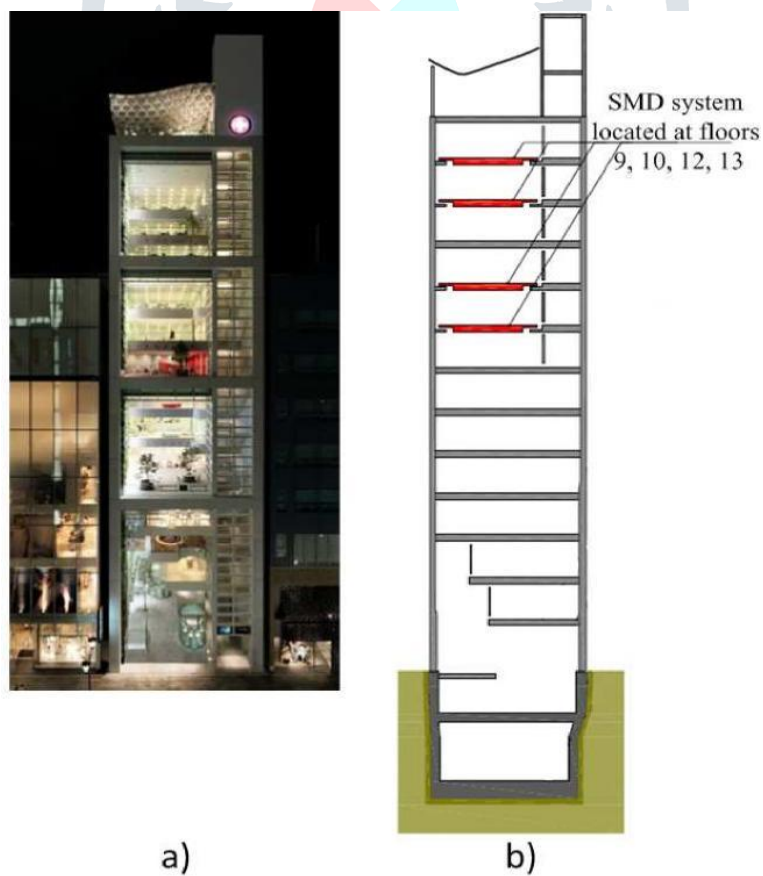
“Nicolas G. Hayek Center”, Japan; self mass damper system: a) external view, b) structure elevation
